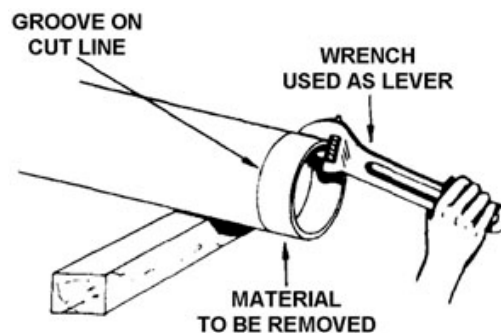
Cutting cast-iron pipe with a hacksaw and an adjustable wrench.
